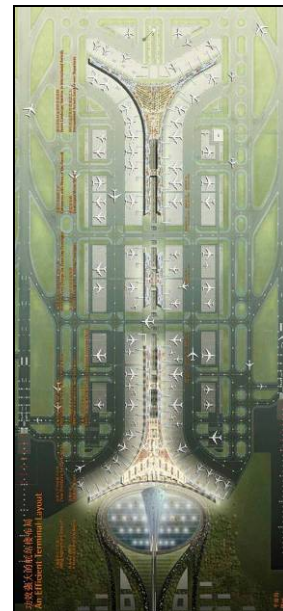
Beijing Int. Terminal Building (Source: Web_10 2009)
